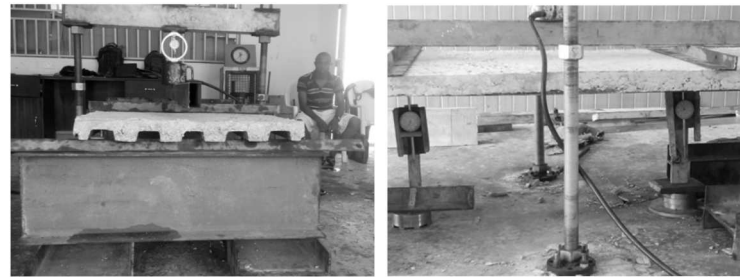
Full scale Steel Profile Concrete Slab (PCS) under analysis using test platform developed in the Department (Adewumi et al, 2014)
